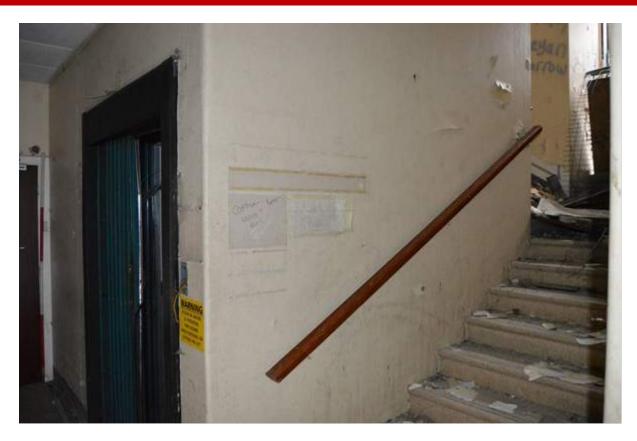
The Ann Canning Childs' Ward for Women stairs which, as built, encompassed a lift. Scale 2m.
